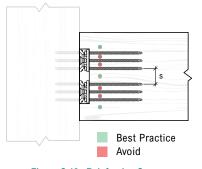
Reinforcing Screw Placement for Avoiding Screw Collisions
